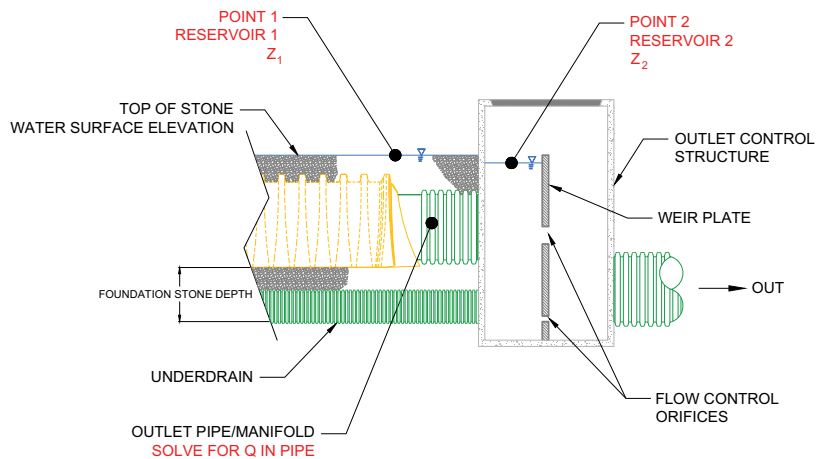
, Outlet connections (reservoir-to-reservoir connection)
